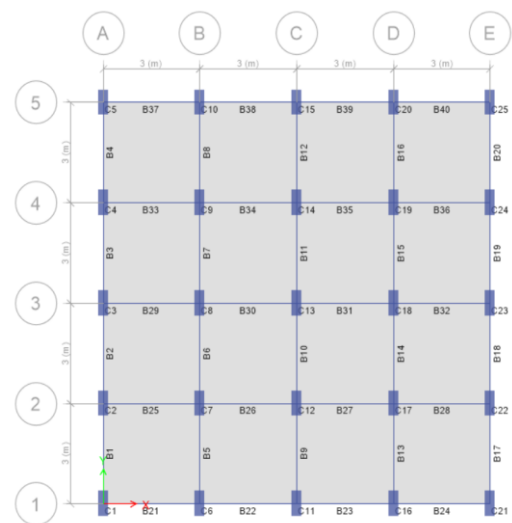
Plan showing beam layout of the building in ETABS 2016
